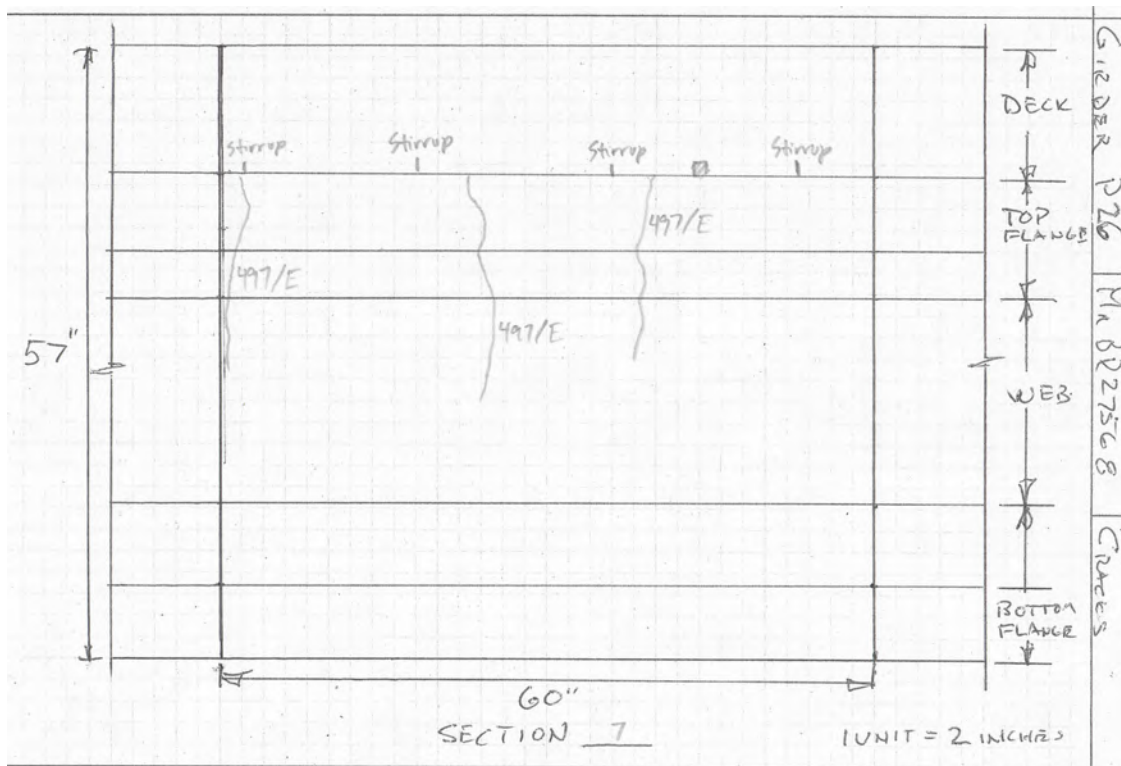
Girder P26 crack pattern – Section 7
